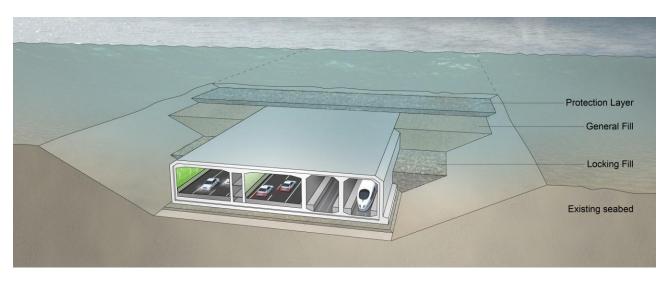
Cross section of dredged trench with tunnel element and backfilling.
